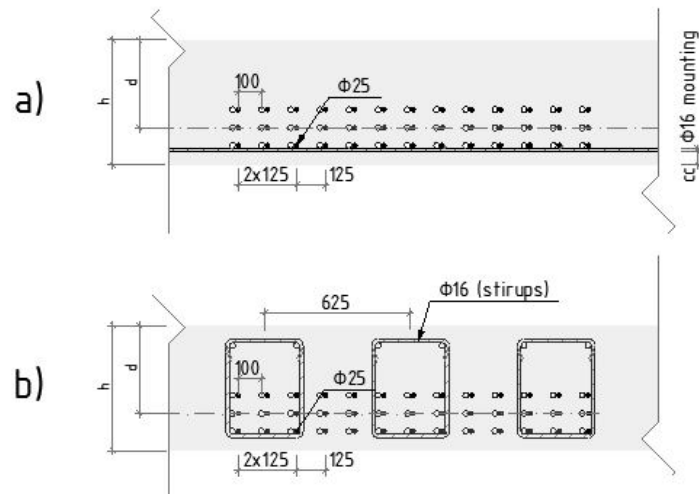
Reinforcement design with 3 layer of tension reinforcement. a) section without shear reinforcement. b) section with shear reinforcement.
